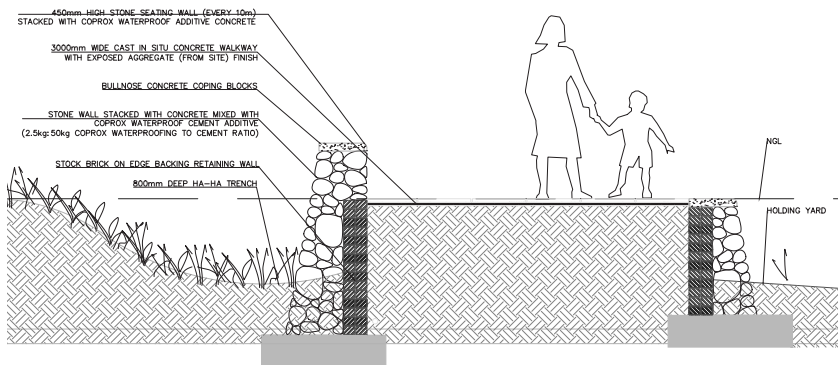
Detail 2-Section detail through Ha-ha trench, paved walkway and seating wall (holding yard to the right and grazing area to the left) - not to scale (Author: 2013)
